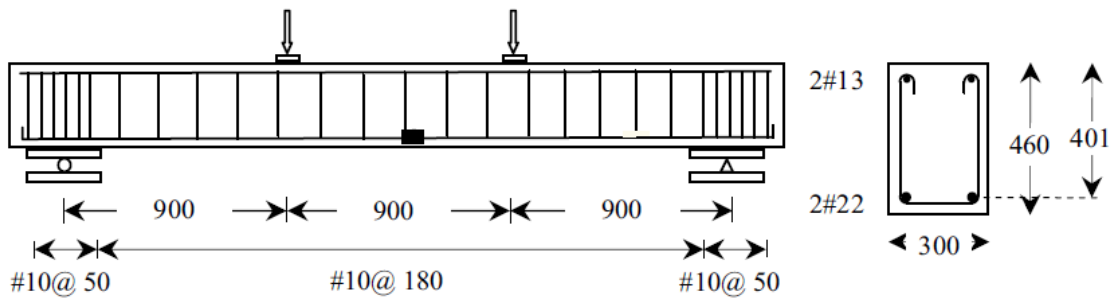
Cross section and reinforcement layout of flexural beam test [44]
